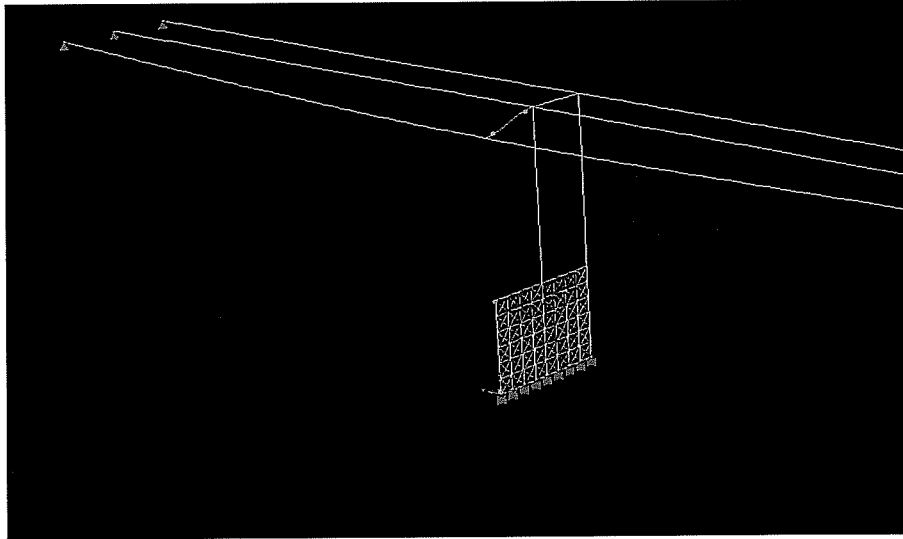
SH-87 Bridge Column Removal Analysis-2
